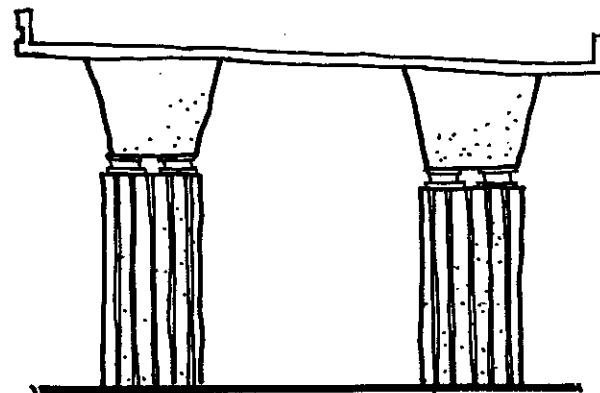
APPROPRIATE STRUCTURE DETAILS
